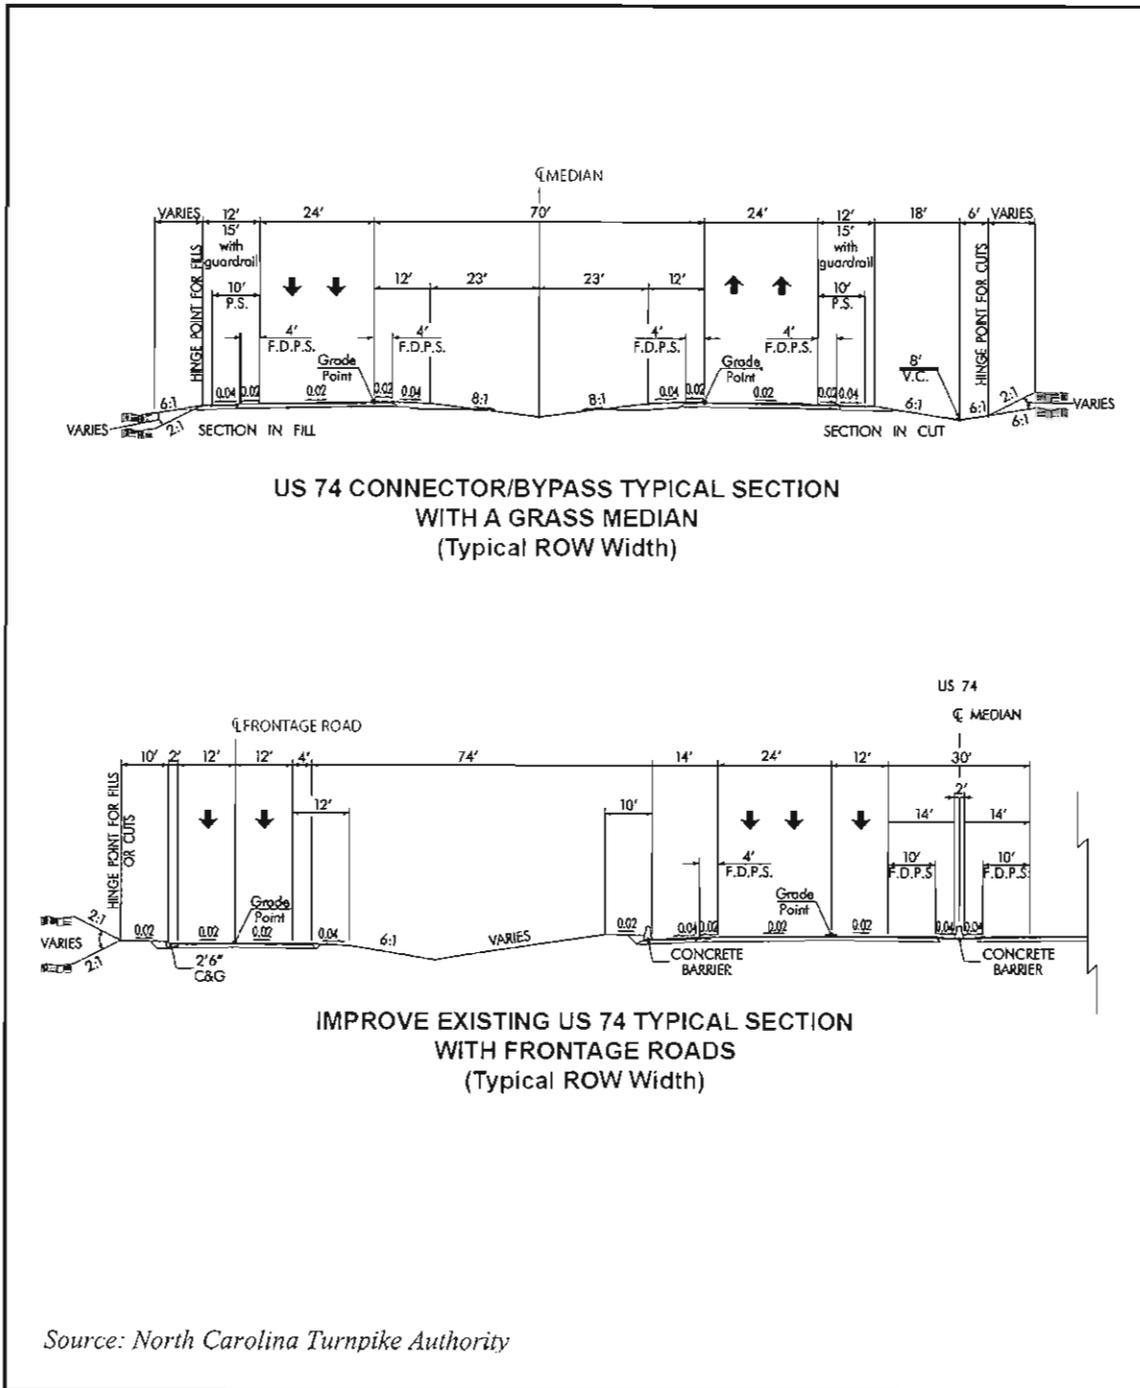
US 74 TYPICAL ROADWAY CROSS-SECTIONS
